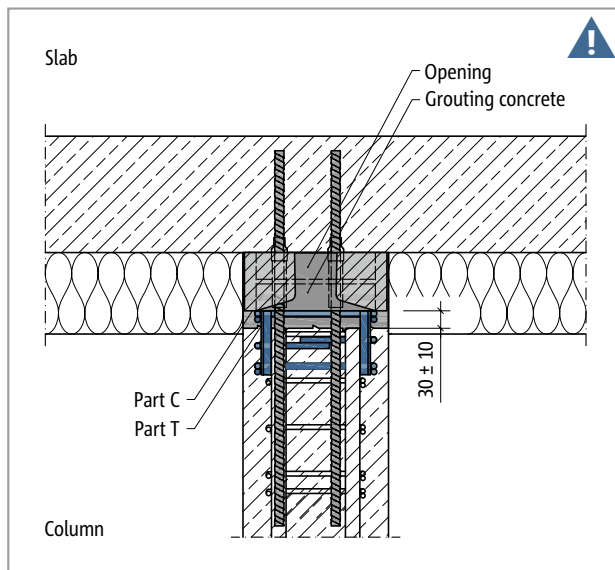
Schöck Sconnex® type P: Installation section; connection column – floor using integrated Part T for the load-bearing safety in combination with Part C
